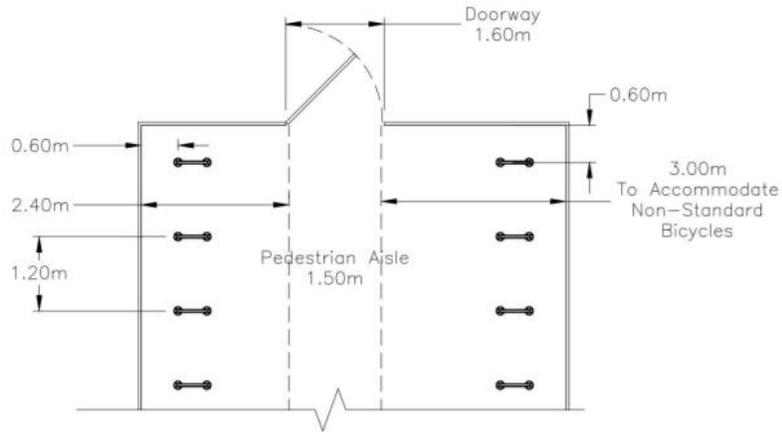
// OFF-STREET BICYCLE PARKING LAYOUT
